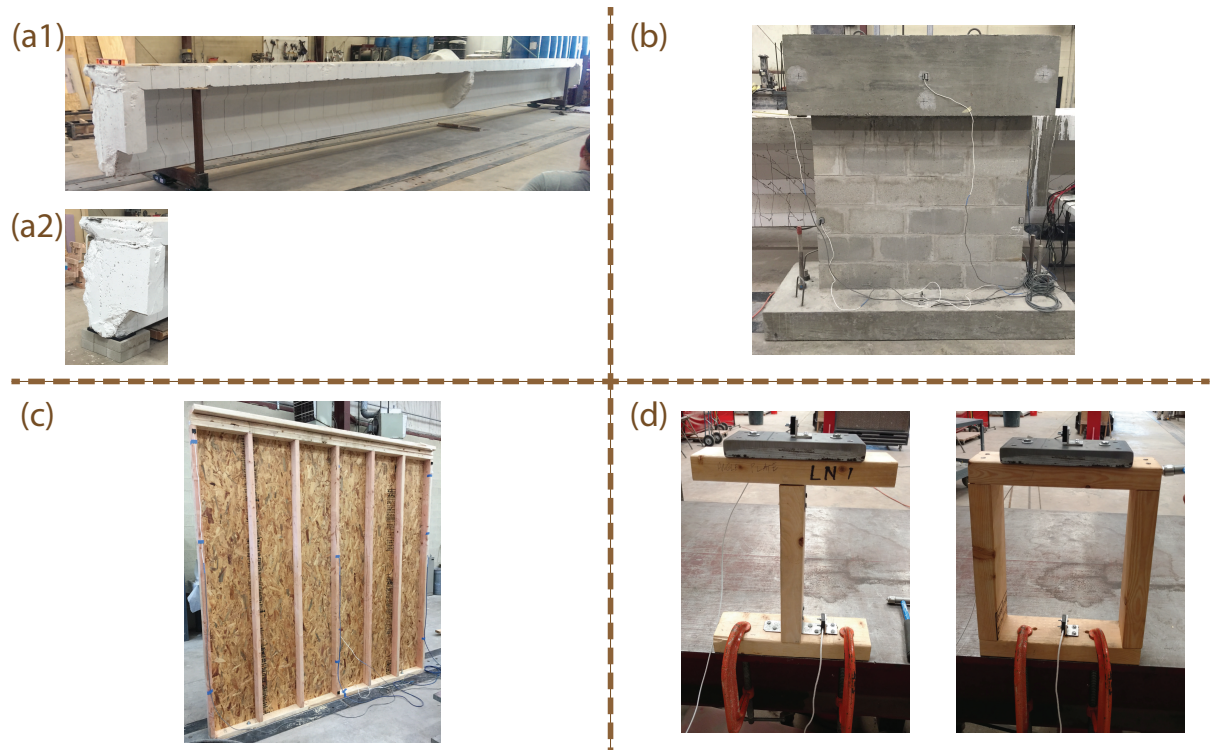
Pictures of specimens studied: (a) prestressed concrete girder; (b) masonry wall; (c) timber wall, and (d) timber joints
